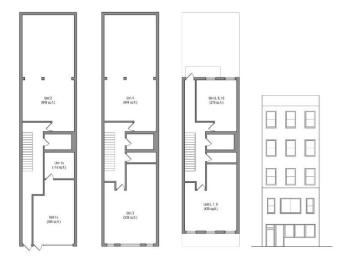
, 200, 201 (left to right): Building 7, first (ground) floor (1925); second floor (1925); floors 3–5 (1925); street-front elevation (1979). For plans, north is up.
